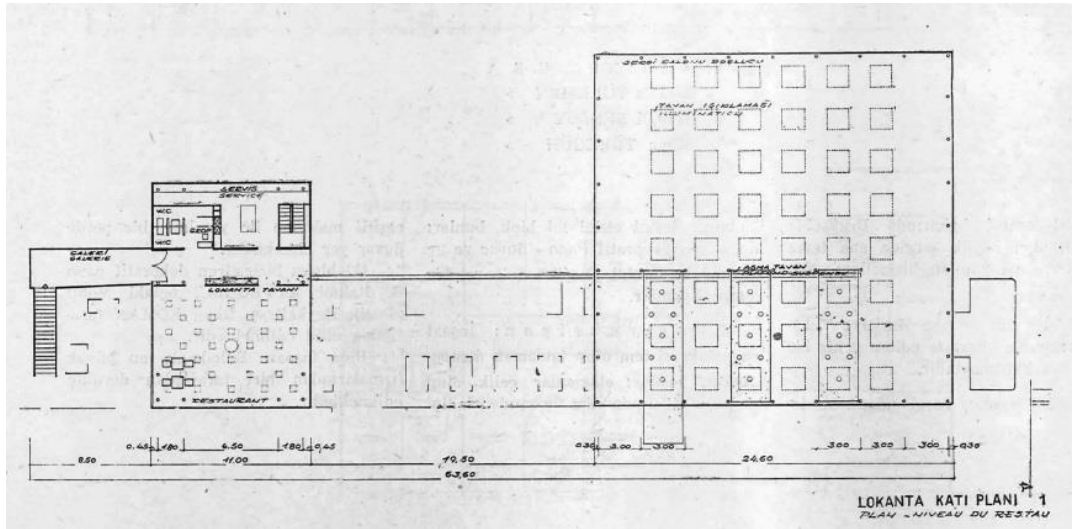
First Floor Plan of 1958 Brussels International Fair Turkish Pavilion
